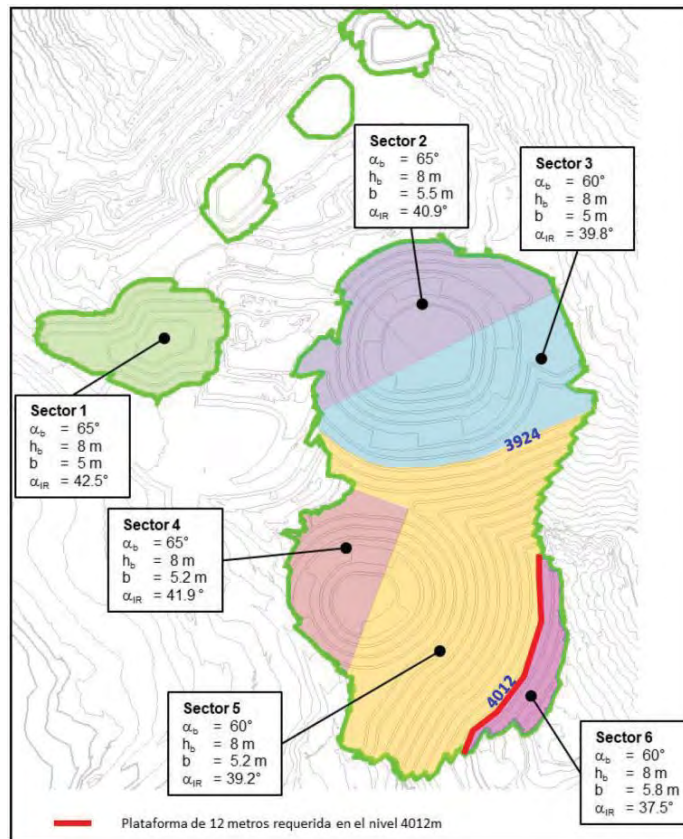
Geotechnical recommendations for Cienaga Norte open pit design
